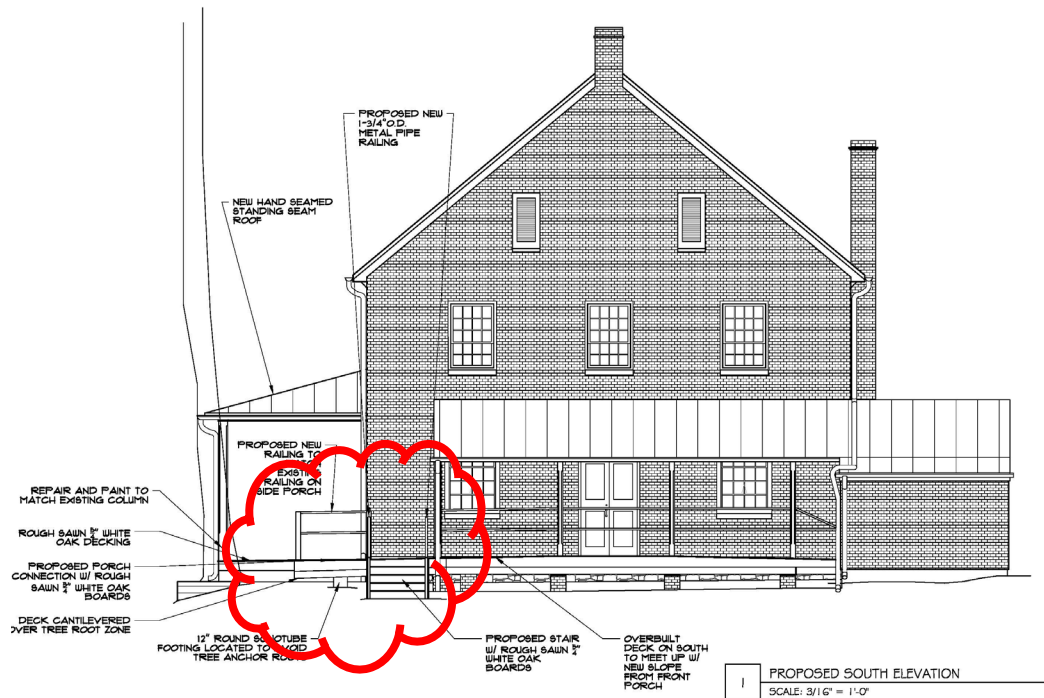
The proposed connecting deck and new stair and railing are clouded in red.
